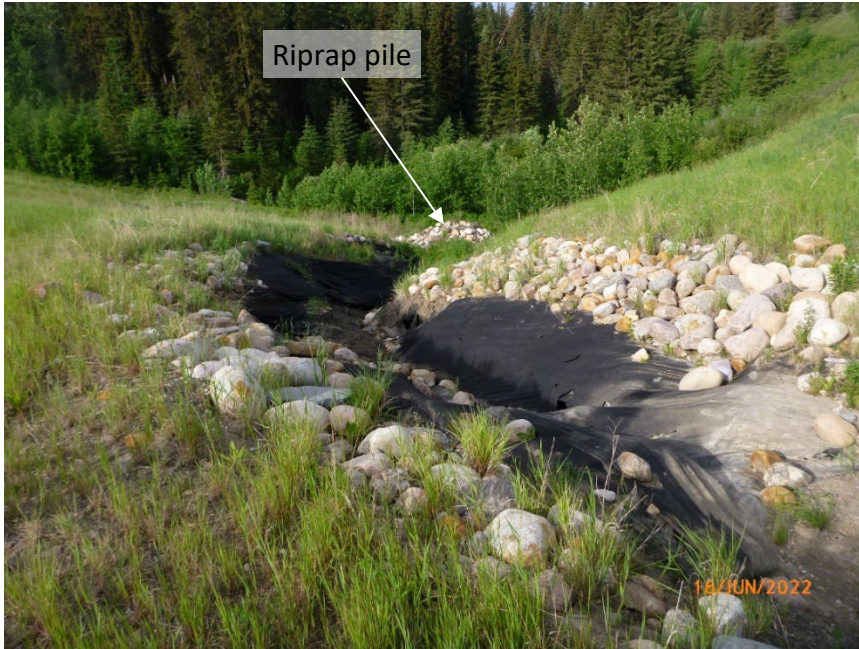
Displaced riprap deposited in pile near bottom of ditch channel. Photo taken June 16, 2022, facing northwest.
